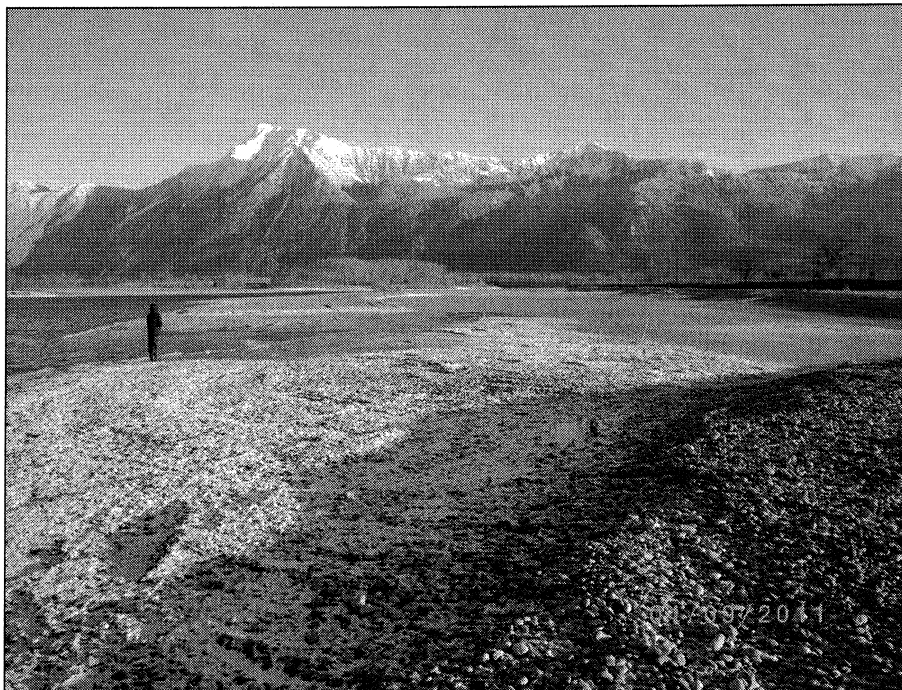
An engineer from Kerr Wood Leidal was onsite to inspect the rip rap bank as the excavator exited the bar. The excavator bucket was used to smooth the disturbance to the sand bar upon final exit of the work site.
